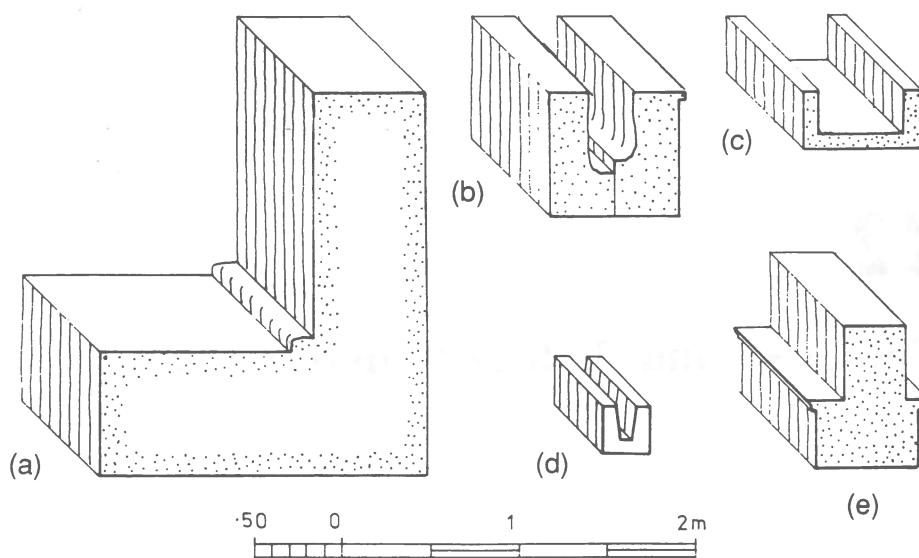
Sections of stone beams found in Greece. (a) architrave, 6th century BC; (b) architraves, c. 500 BC; (c) ceiling beam, c. 420 BC; (d) lintel, c. 630 BC; (e) cross beam, c. 320 BC. [Coulton 1977:145]
